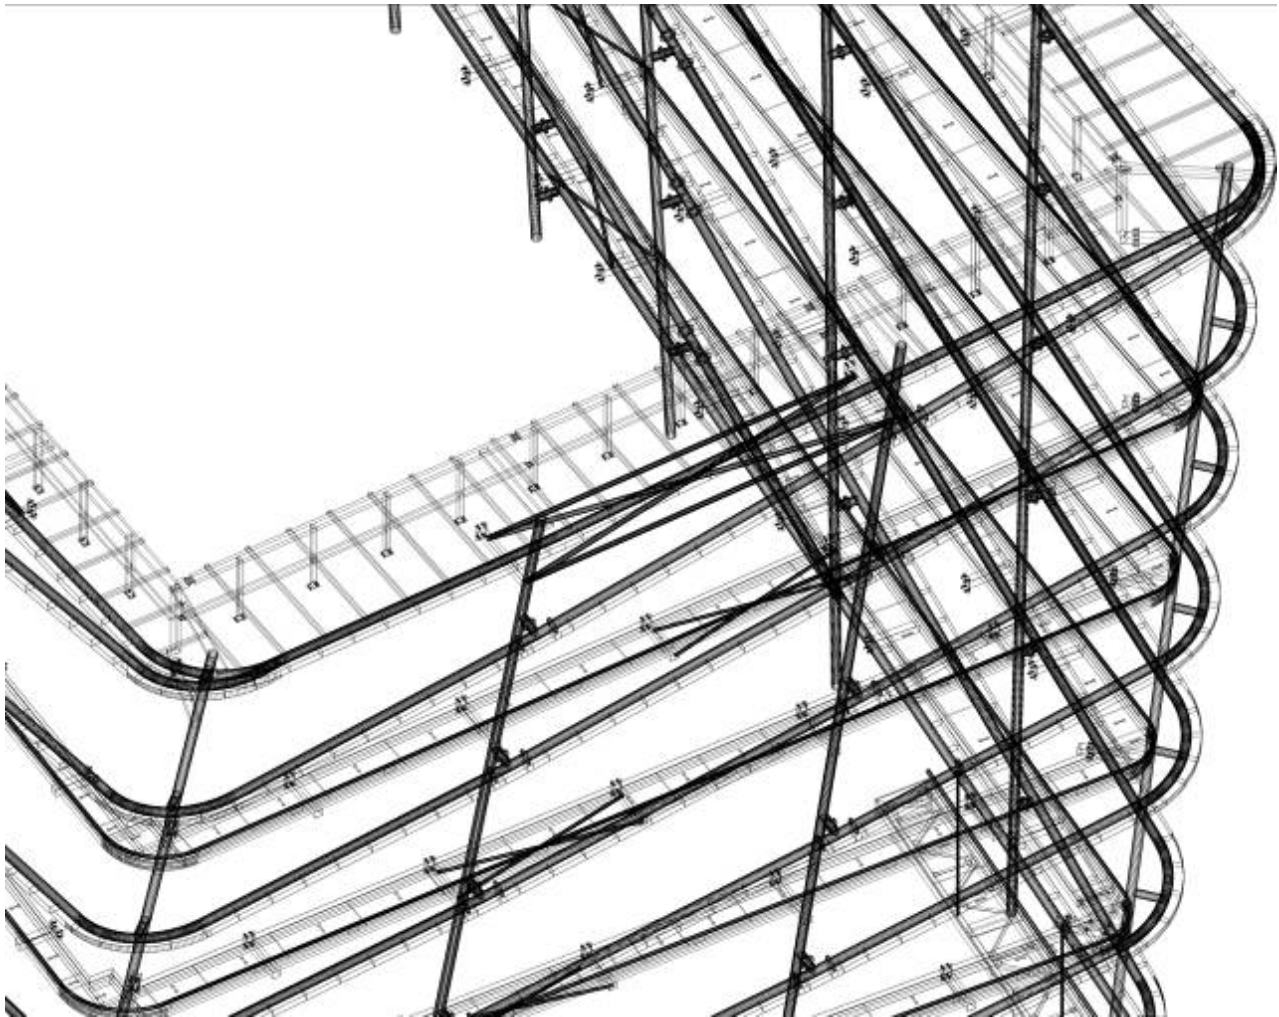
Steel structure and aluminium ETFE detailing—structure engineer's 3D model [2].
